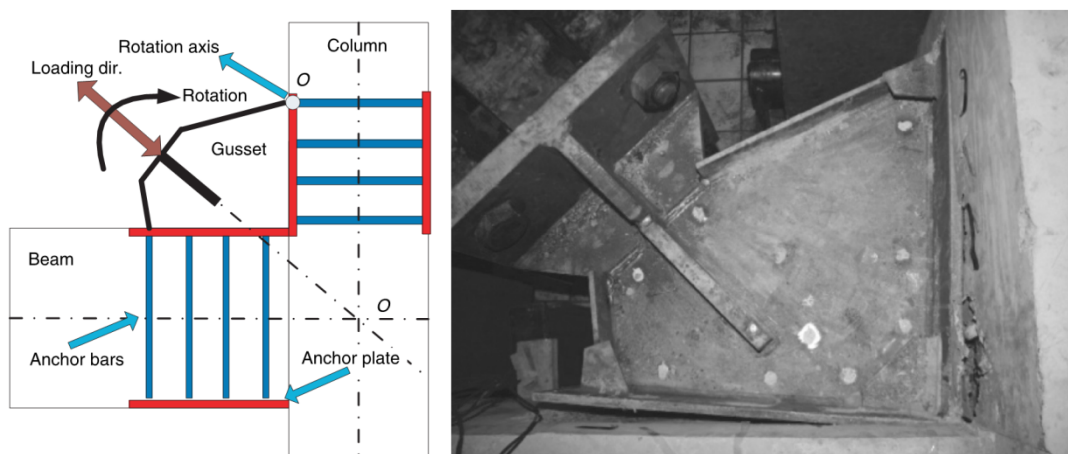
schematic diagram of anchorage connection (Left) and failed connection (Right) - Li et al. (2013)
